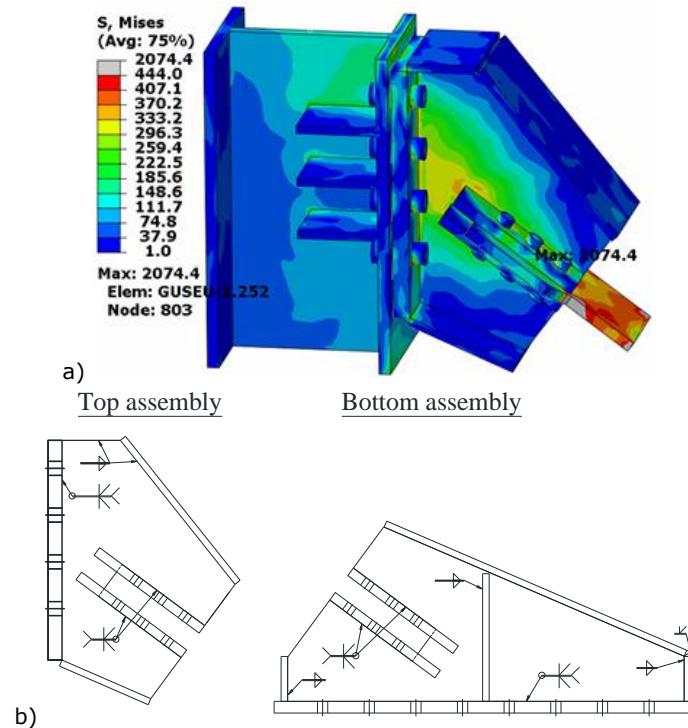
Gusset-connection assembly: a) FEM simulation, b) details [6]
